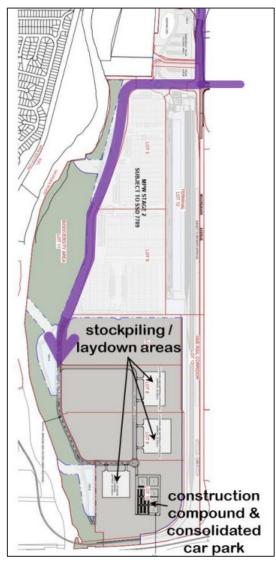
| Anzac Road construction access point (Source: Applicant's EIS)
